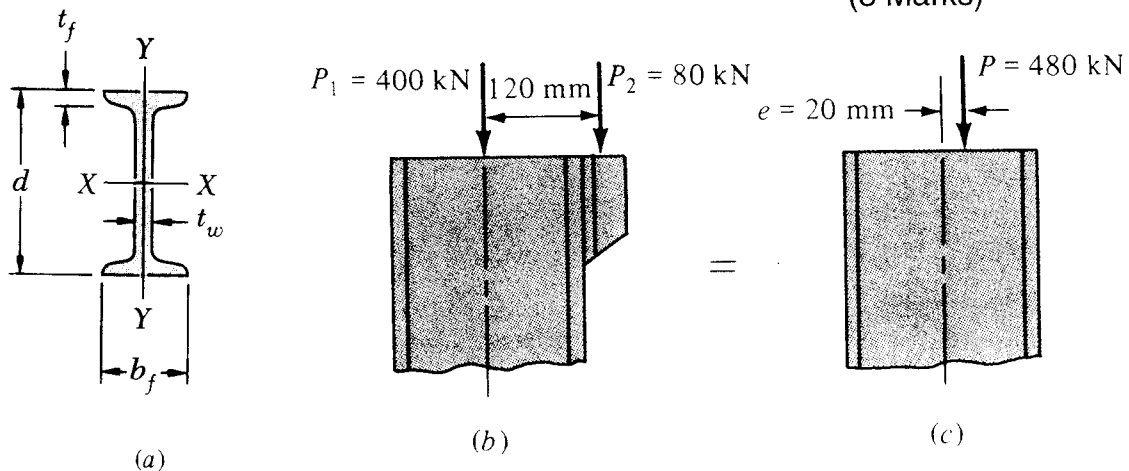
Qb: Rolled steel type S 200 x 34 cross section
